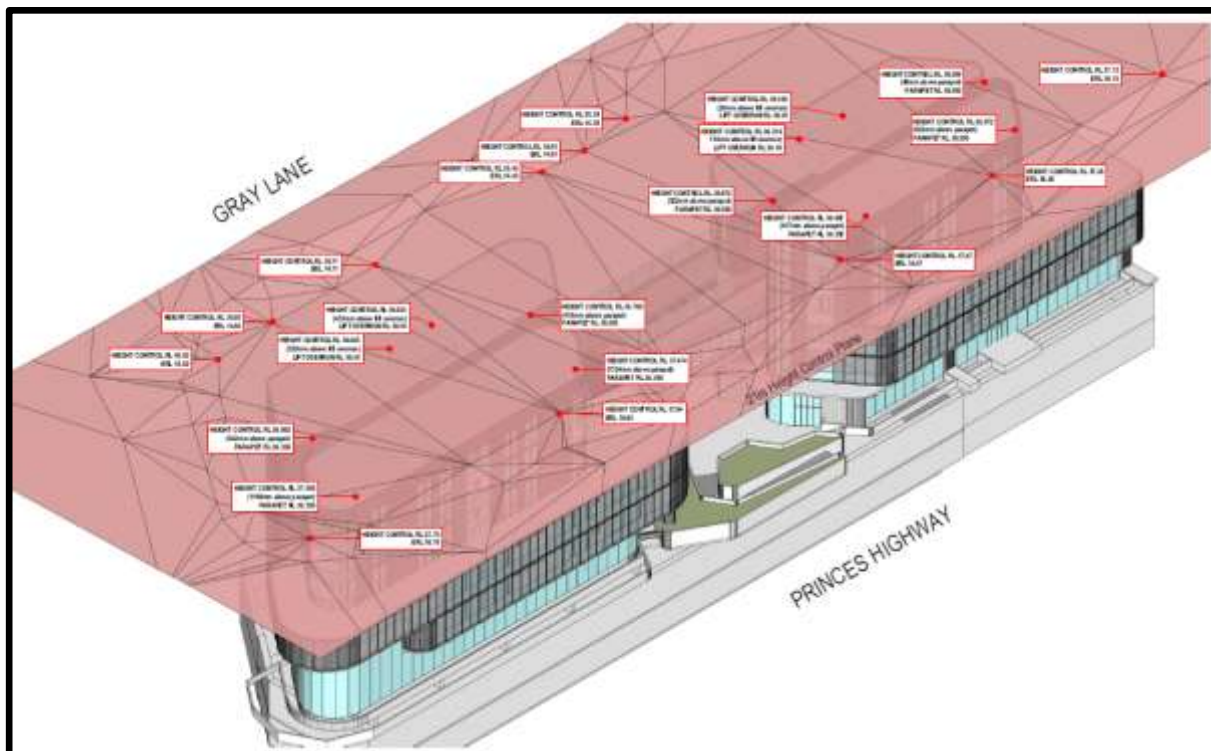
3D Modelling views of the 21m Height plane (courtesy: SWA group 2020)
